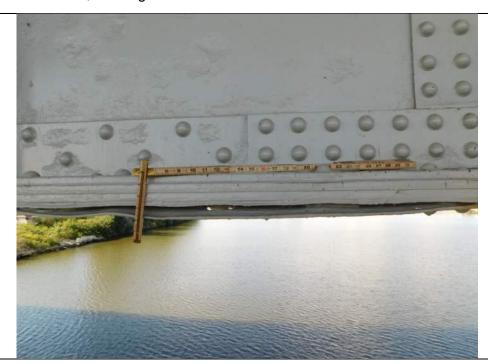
[Span 2] -Girder 4W East bottom flange, cleaned packing corrosion with section loss to the plate, Looking West
